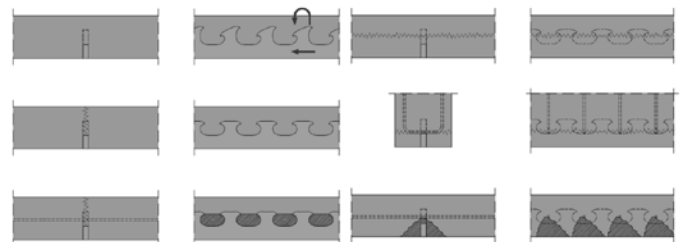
Failure modes of composite dowels – yielding of steel dowel by bending and shearing, vertical crack in the non-reinforced concrete deck, shearing of concrete dowel, horizontal crack in concrete deck, spalling of concrete cover, pry-out cone in the concrete cover [7]
